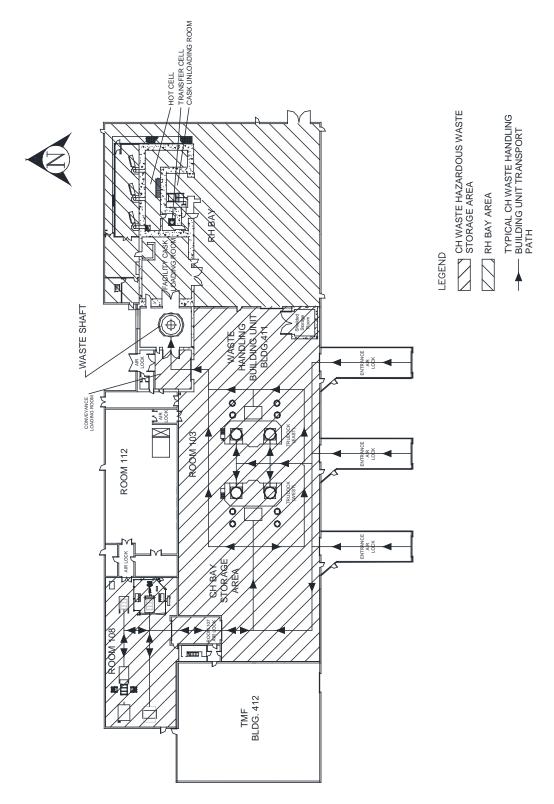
Typical CH Mixed Waste Transport Routes in Waste Handling Building - Container Storage Unit
